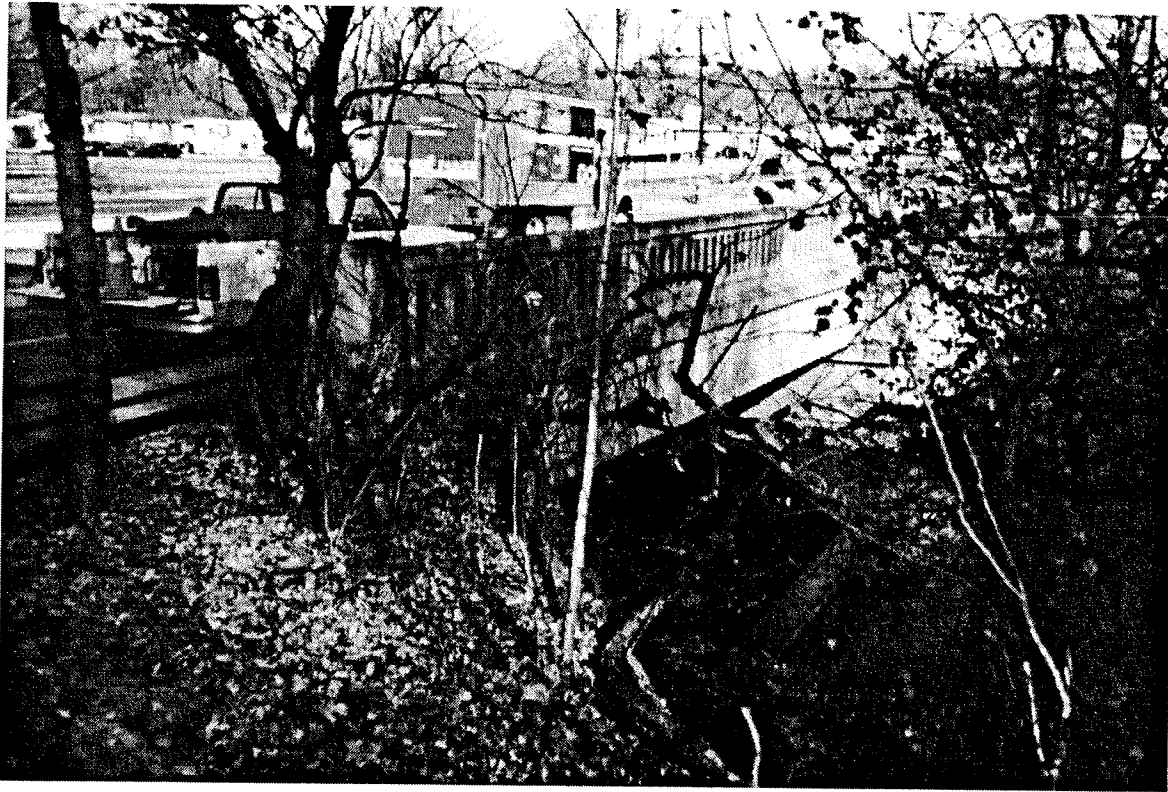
Photograph of Bridge No. 1123-152, Route 130 over Rock's Brook, East Windsor Twp., Mercer County, New Jersey.
